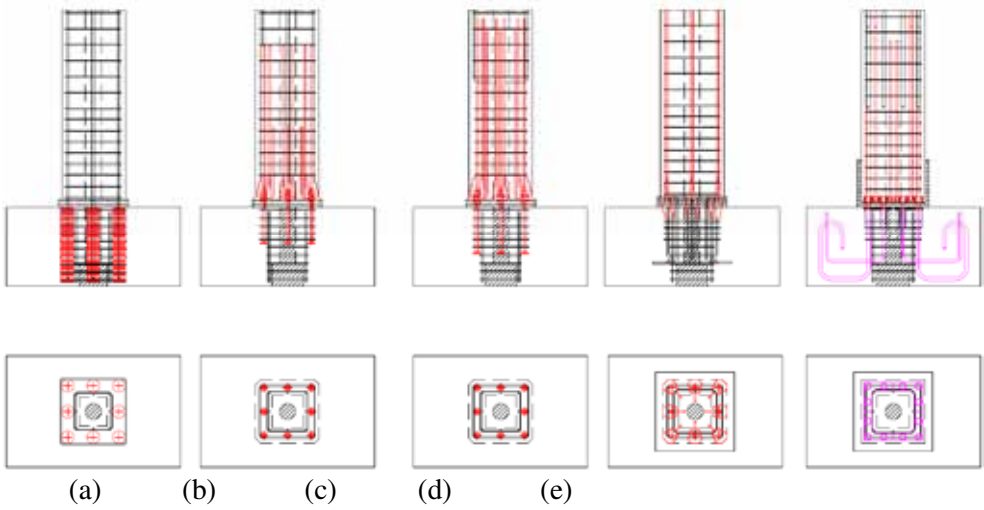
Column-to-foundation connections tested in this project: (a) *post-inserted protruding bars*; (b) *column shoes bolted sockets*; (c) *weakened column shoes bolted sockets*; (d) *foundation shoes bolted sockets*; and (e) *couplers*.
